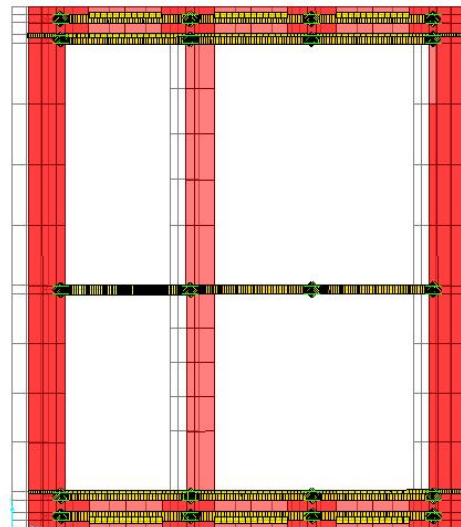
Mode Shape of Existing Building (Mode 1)
